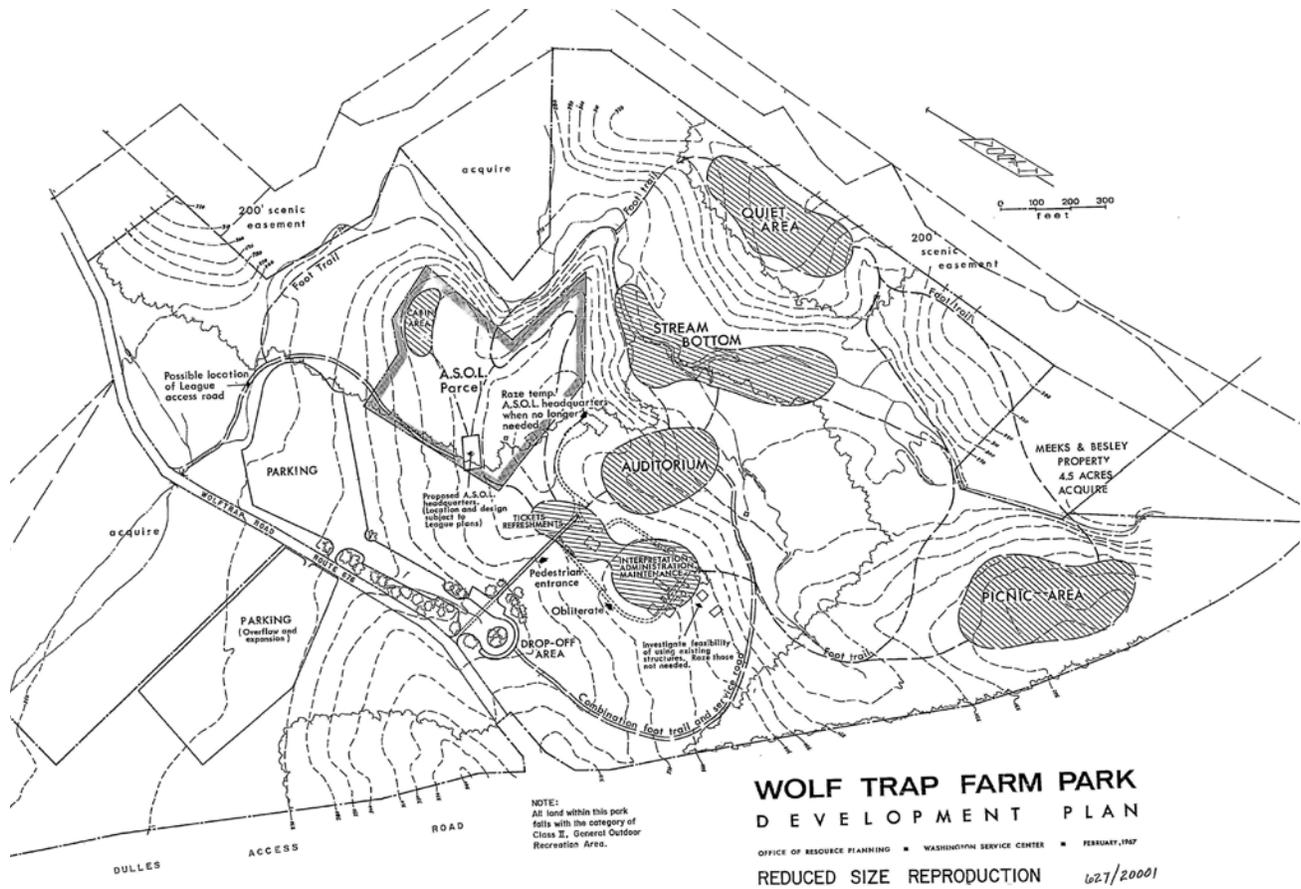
1967 NPS development plan for the park, showing original proposed location of the amphitheater (labeled auditorium) (National Park Service).
